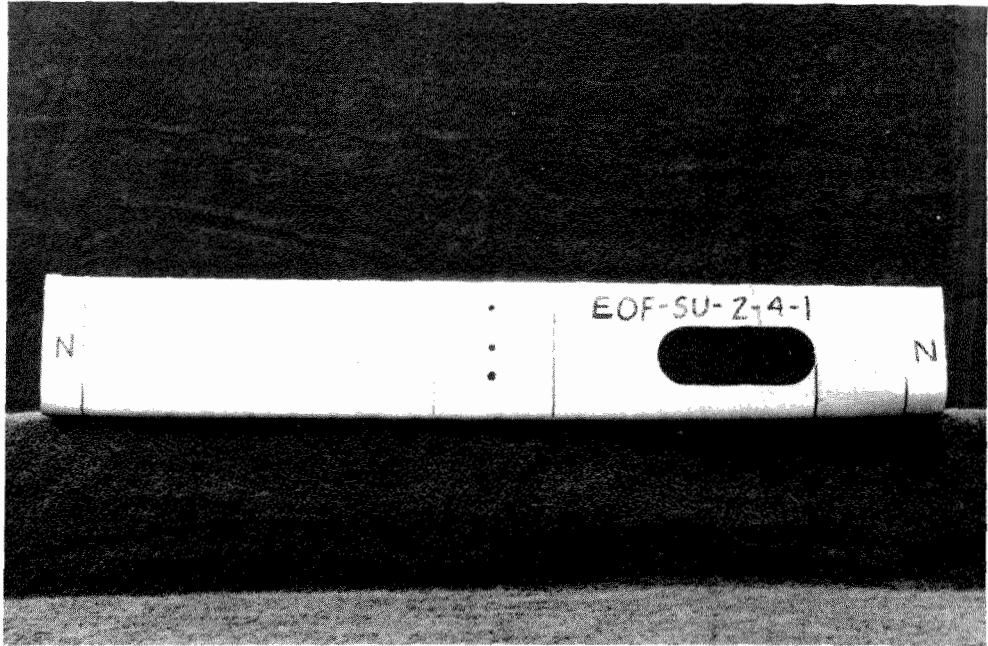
Typical Unreinforced EOF Web Crippling Failure, EOF-SU-2-6-1
